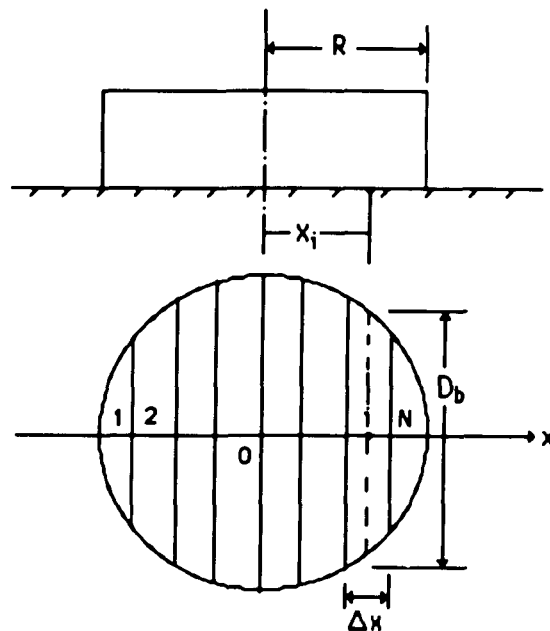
THE FOUNDATION BASE DIVIDED INTO N STRIPS
